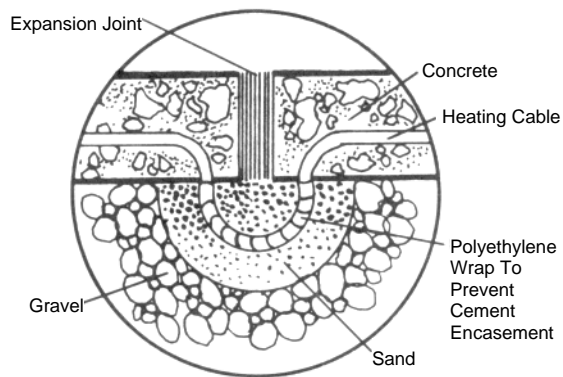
A METHOD OF CROSSING EXPANSION JOINT
